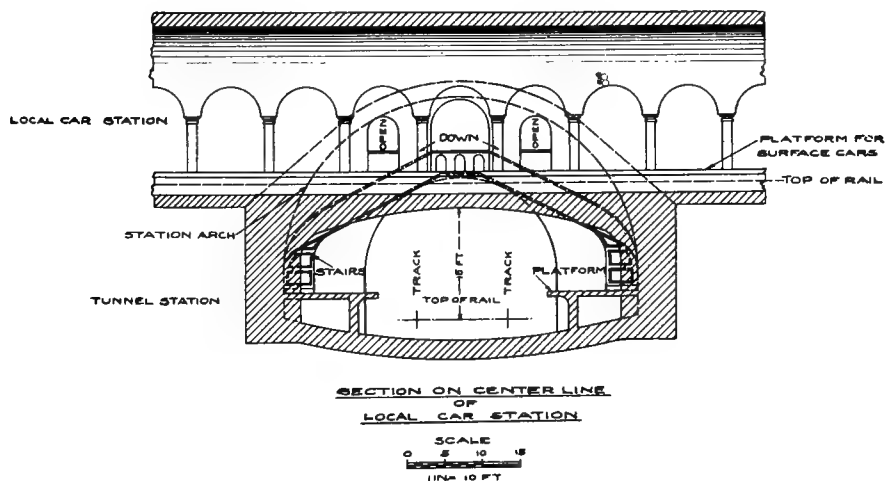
LAGUNA HONDA STATION, SECOND STAGE.
